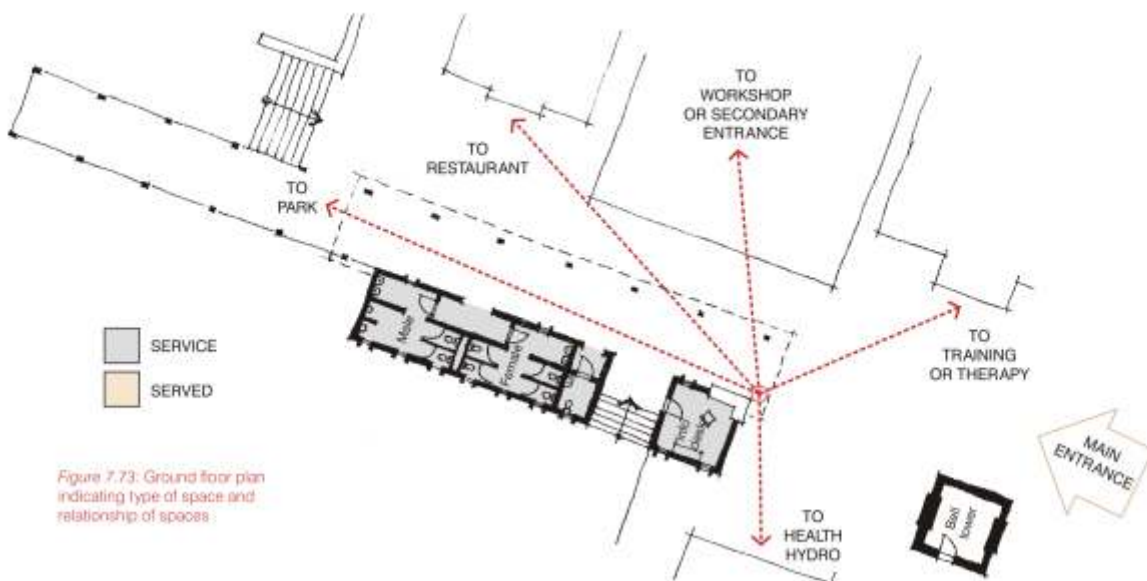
Ground floor plan indicating type of space and relationship of spaces
